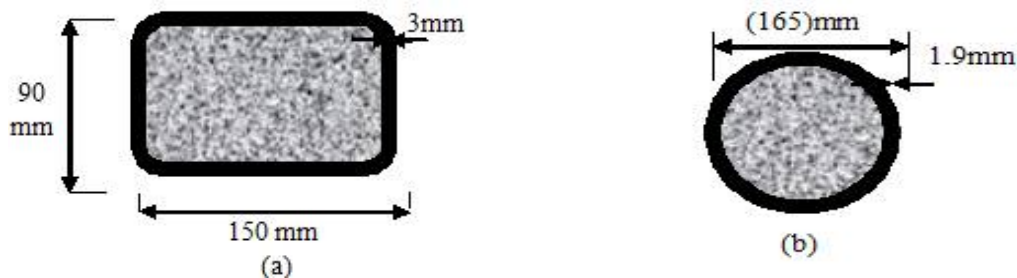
Cross-Sectional Dimensions of Test Specimens: (a) Concrete-Filled RHS; (b) Concrete-Filled CHS
